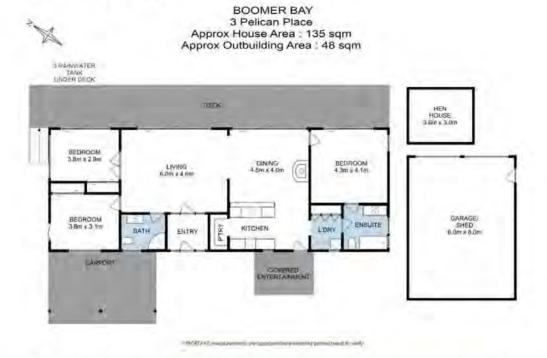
Floor plan of 3 Pelican Place (https://www.realestate.com.au/property/3-pelican-pl-boomer-bay-tas-7177)
